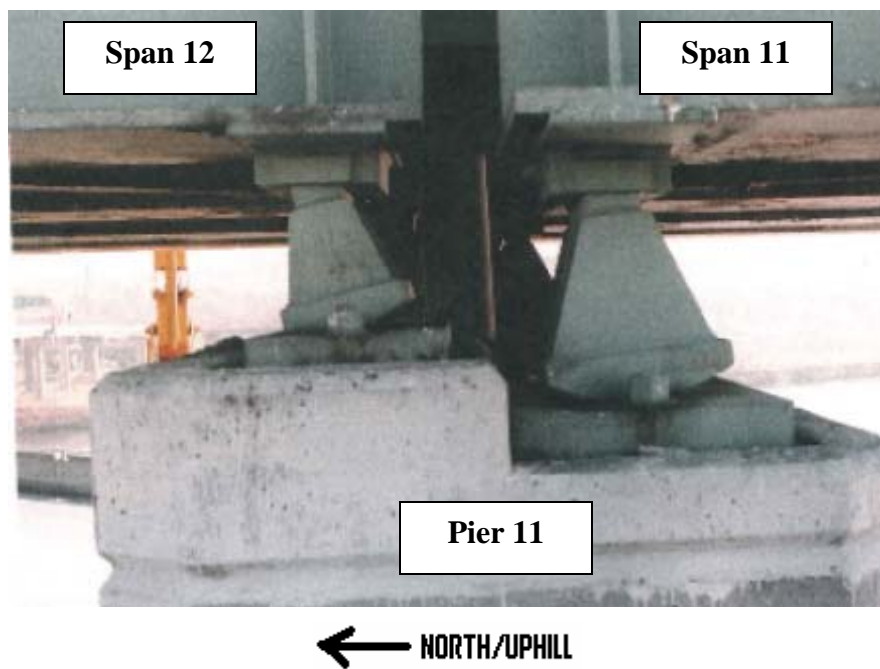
Photograph of the Pier 11 bearings during a 1989 inspection.
